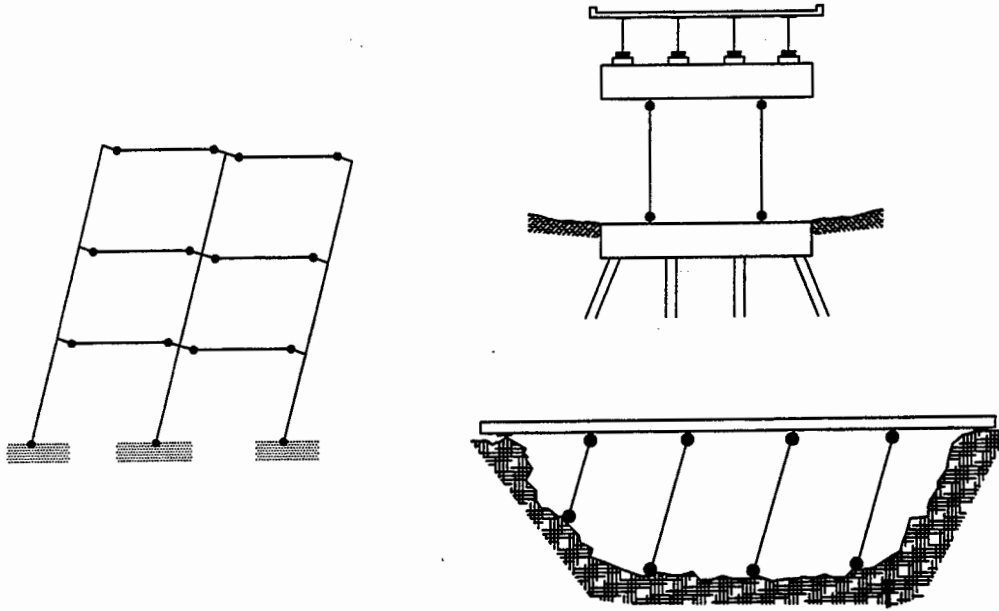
Admissible Failure Mechanisms in Reinforced Concrete Sections
